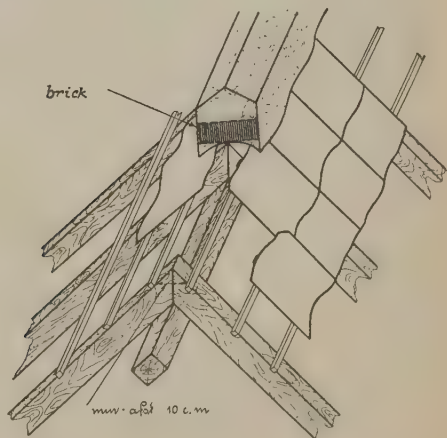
Soundly constructed tiled roof with brick work ridge (the space between ridge and roof-tree must not be completely filled.)
